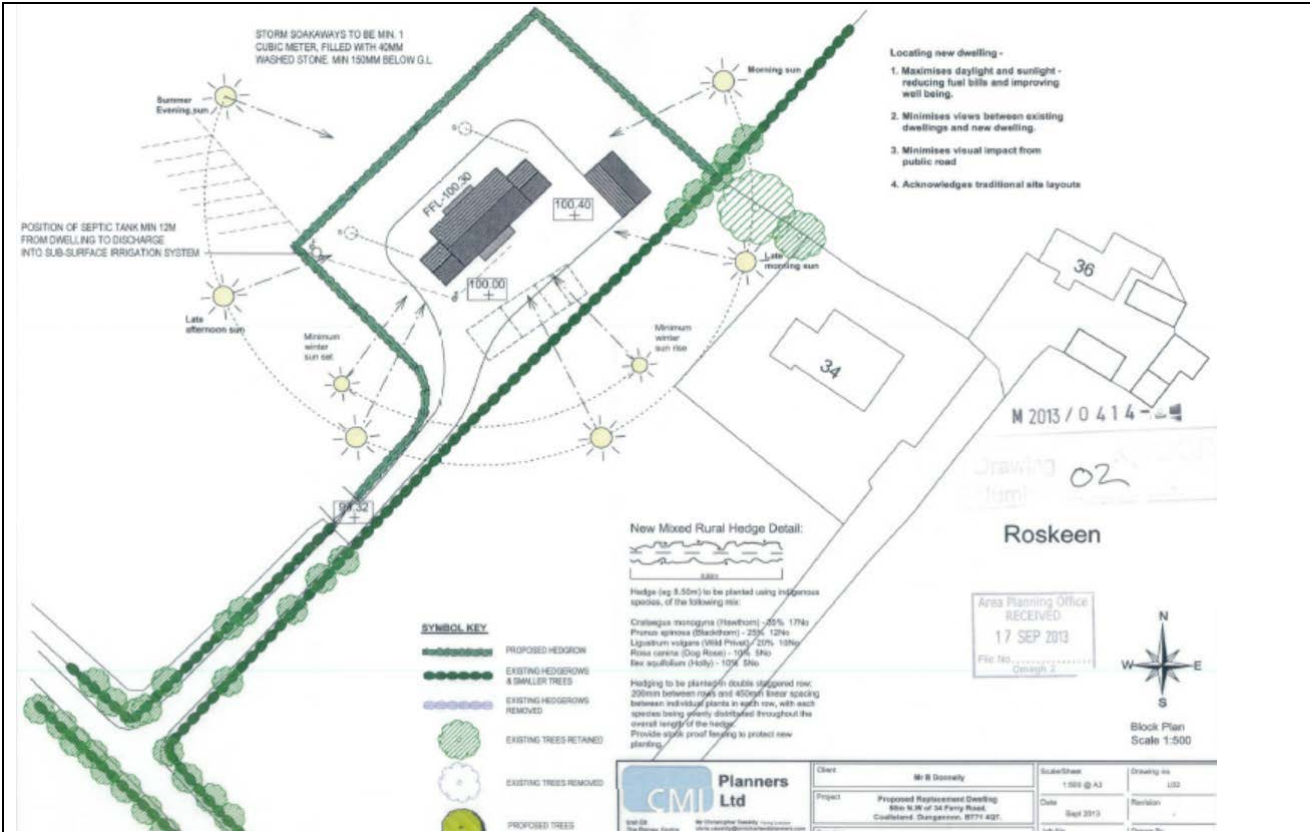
Block plan of dwelling and garage approved under M/2013/0414/F
